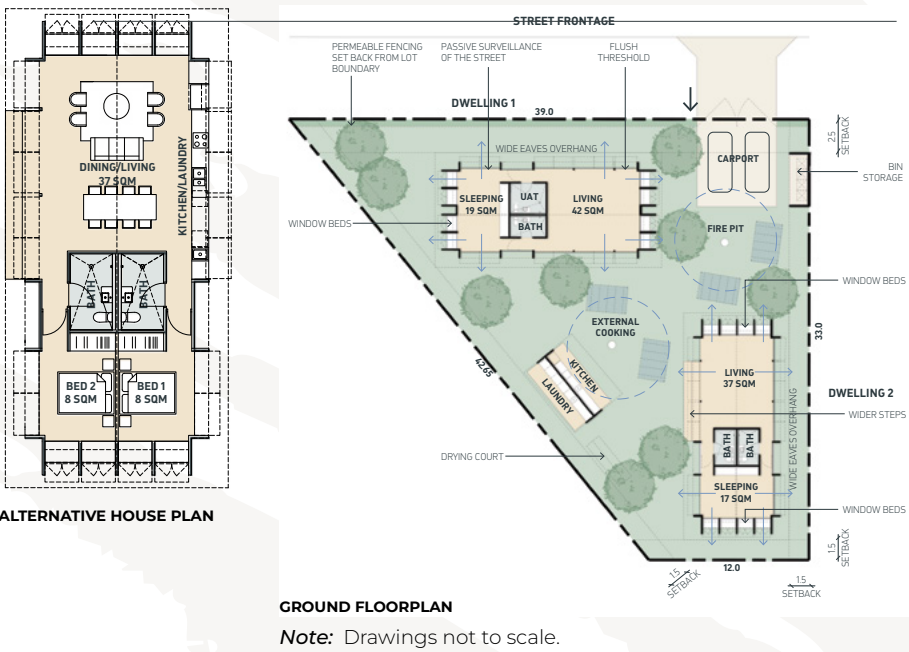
Concept Plan - Alternate intergenerational / retirement housing
